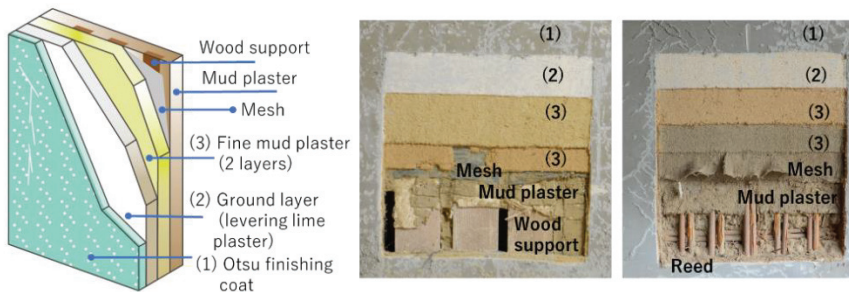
Layer composition of Otsu wall in the walls shown in Figures 2a and 2c
